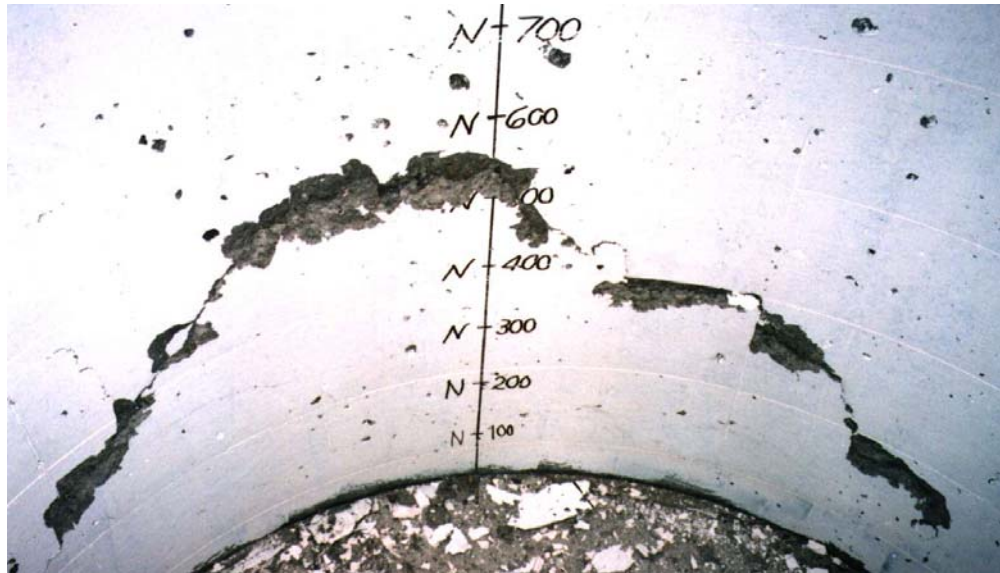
Panoramic View of Inside Face Concrete after Testing (E-N-W)
